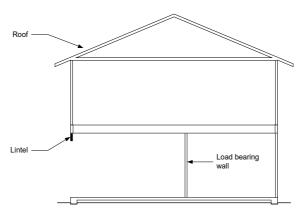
Lintels Supporting Roof, Wall and Floor (Refer Table 8.9)
